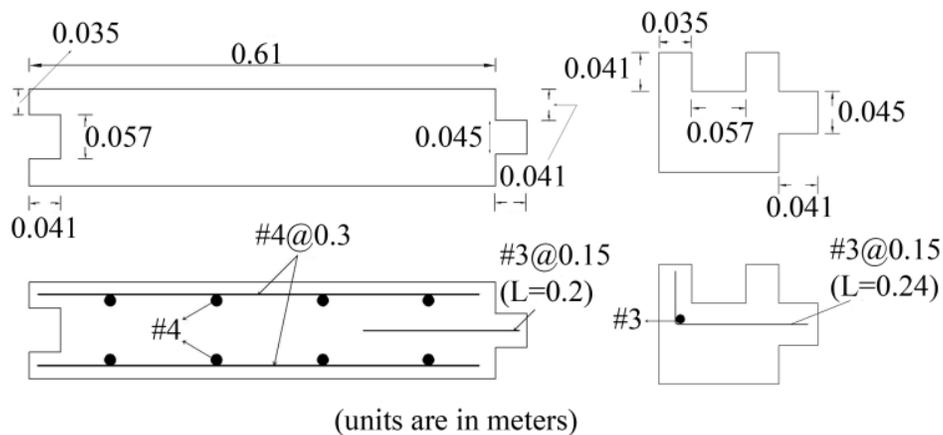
Reinforced Concrete Panel and Corner Unit Detail
